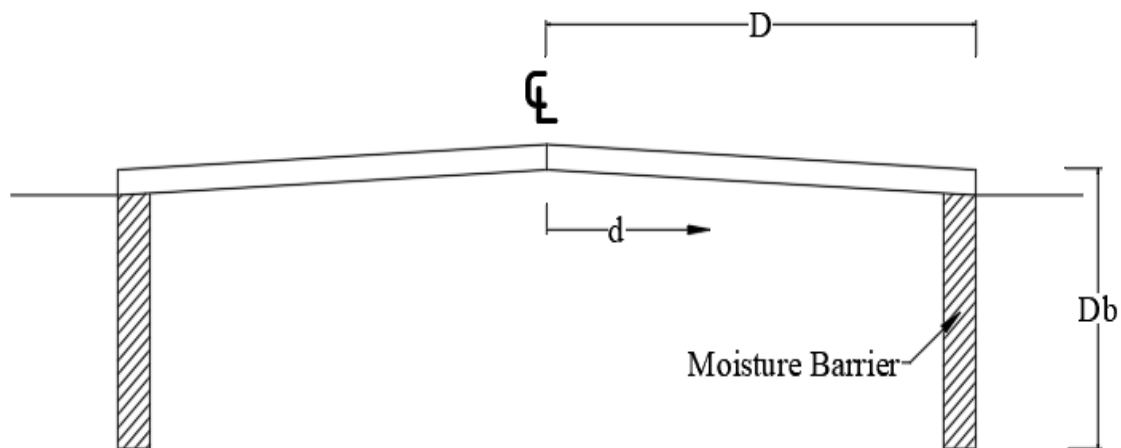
Typical Cross-Section of a Pavement with Vertical Moisture Barriers (Jayatilaka, 1999)
